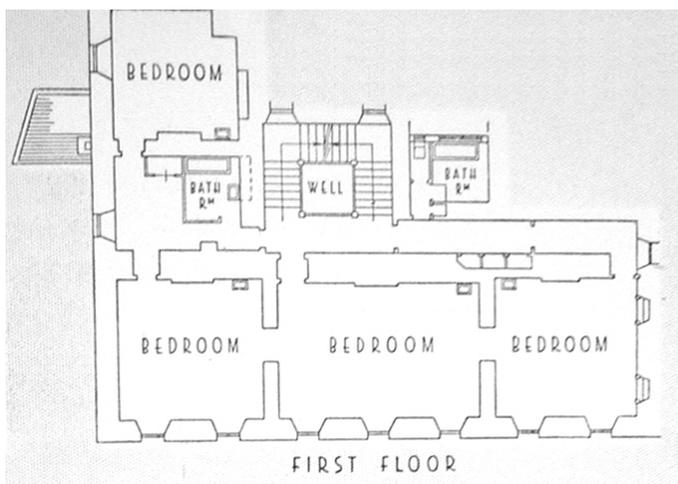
(left): First floor plan, c1949 (High Duty Alloys Ltd c1949)
